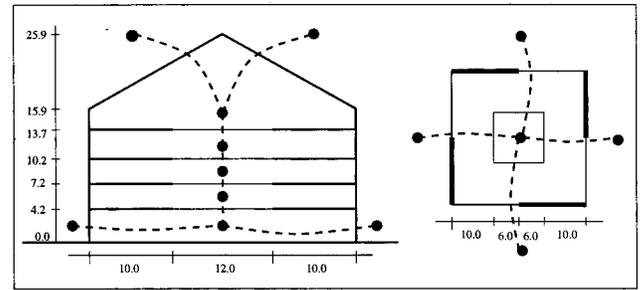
Cross-section and plan of atrium with air flow network. Dimensions in m; to obtain ft, divide by 0.3048.
